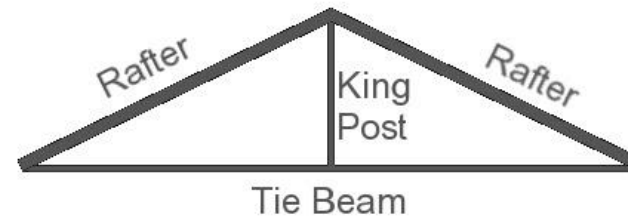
(b): King Post roof trusses (Riva,2017)
